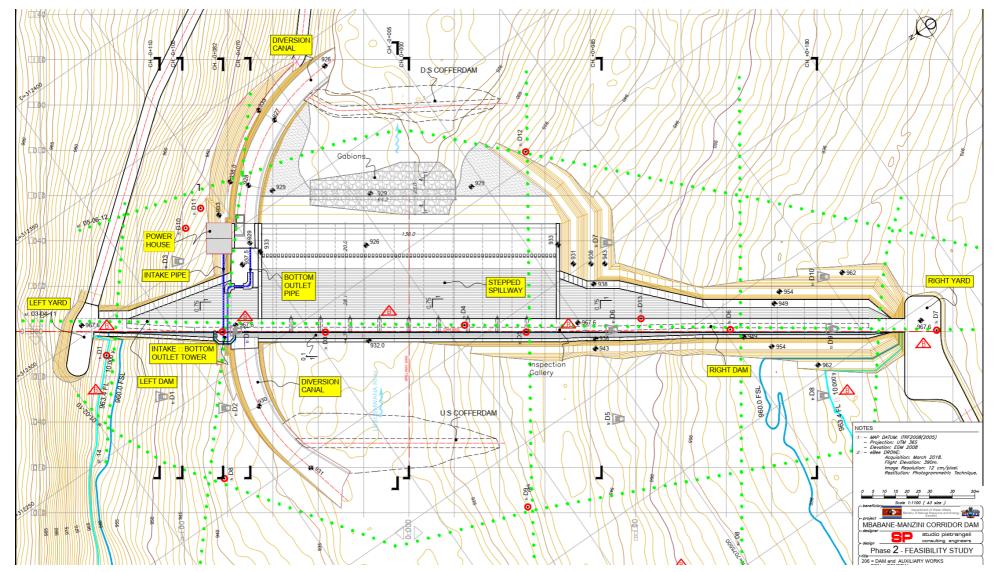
Layout of the Nondvo Dam and Auxiliary Works (Studio Pietrangeli, 2019)
